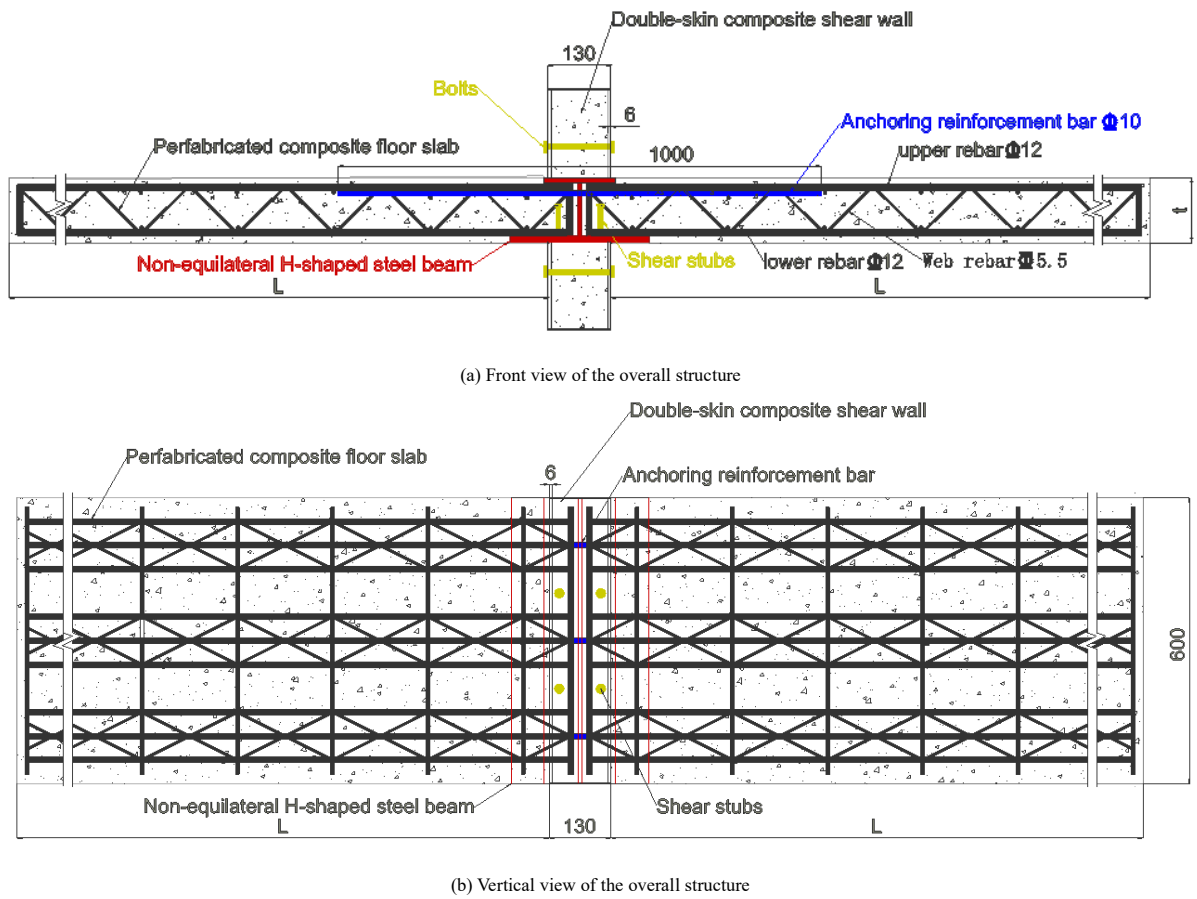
Specimen size and overall structure (taking Type II joint as an example)
